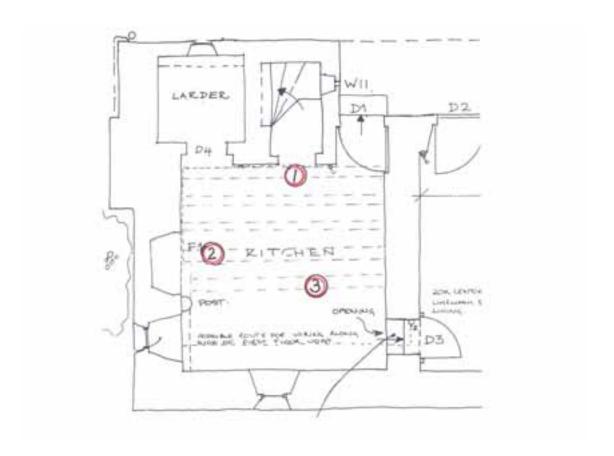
Plan showing ground-floor beams sampled (after Seymour and Bainbridge)
